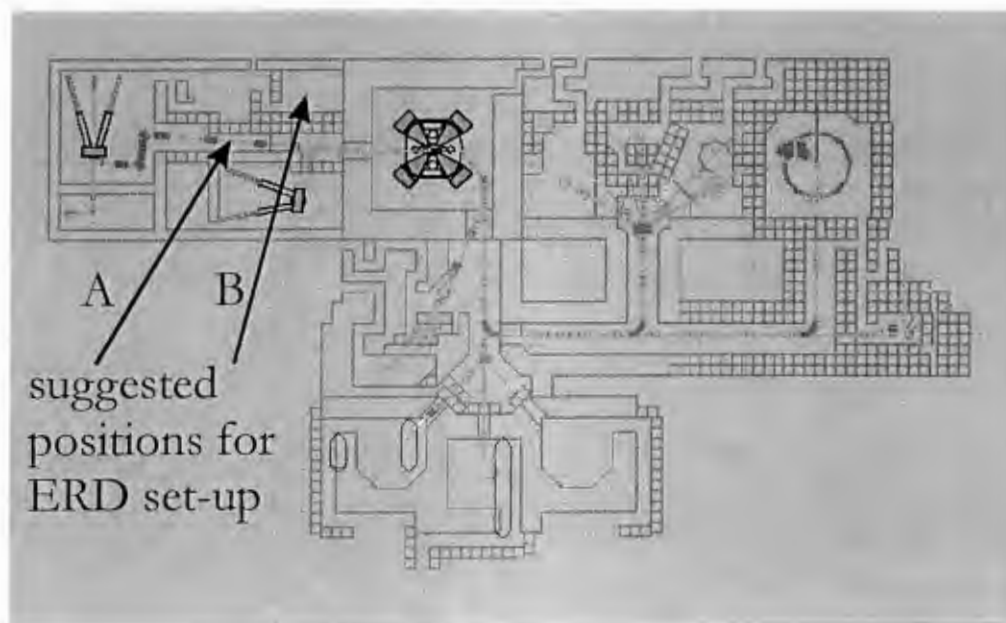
Floor plan of the cyclotron facility at iThemba LABS with the 2 positions indicated as A and B
